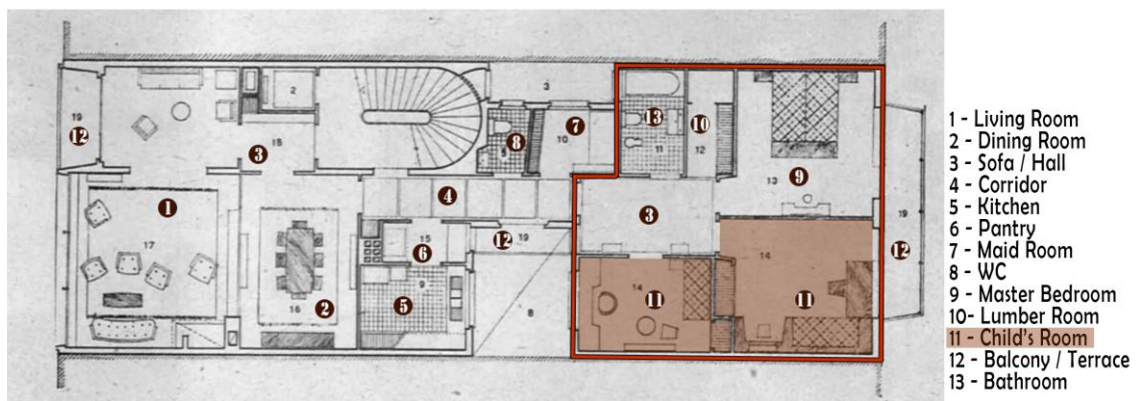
The regular floor plan of M.K. Apartment, İstanbul (Arkitekt, 1957, 3)
